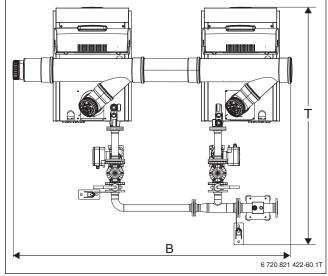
2-boiler cascade, lane installation (dimensions → Table 30, page 79)
